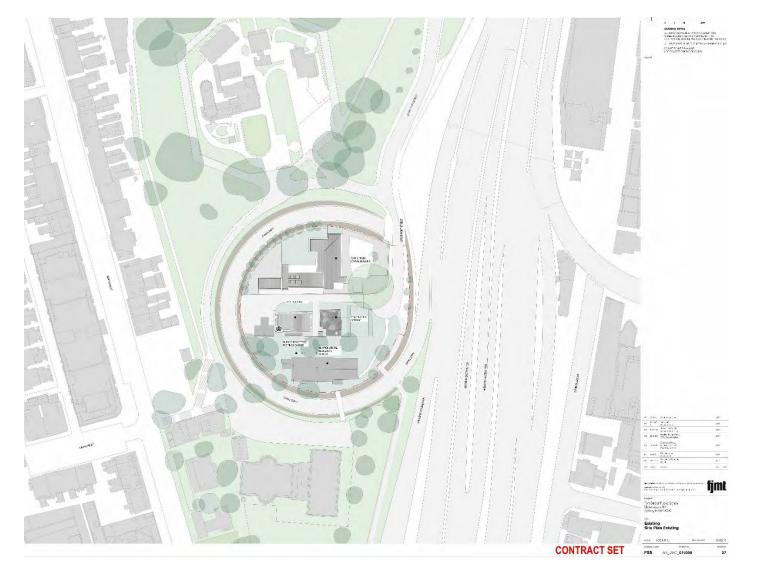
Existing site plan. (Source: Lendlease, 2021)
